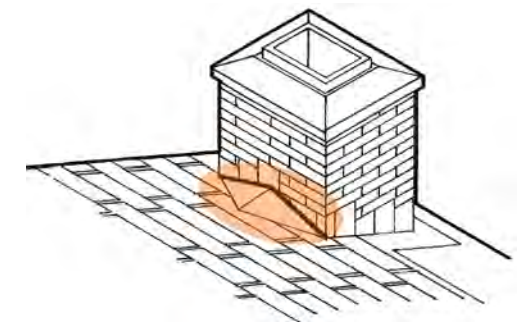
Flashing "cricket" used to divert water away from the face of the chimney
